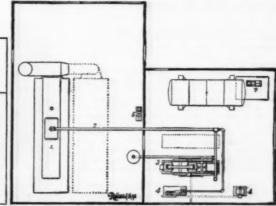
WUERPEL SHOPS-GROUND PLAN
